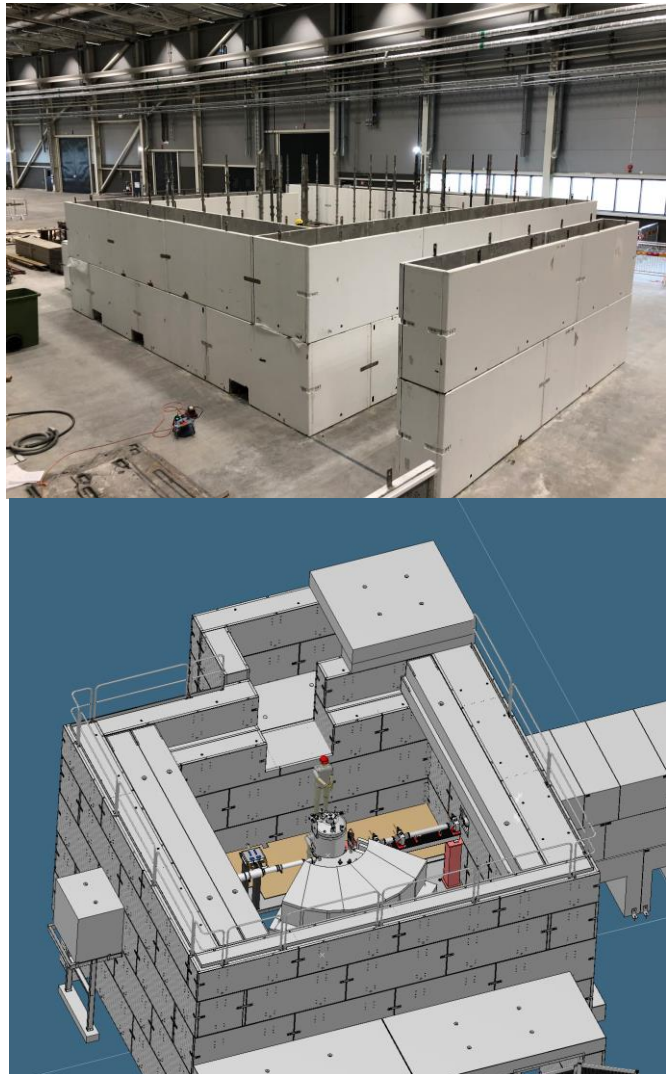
(top) Picture of cave installation work, with precast panels being put in place to be filled with concrete. Installation is still ongoing. (Bottom) CAD screenshot of the soon to be finished cave.
